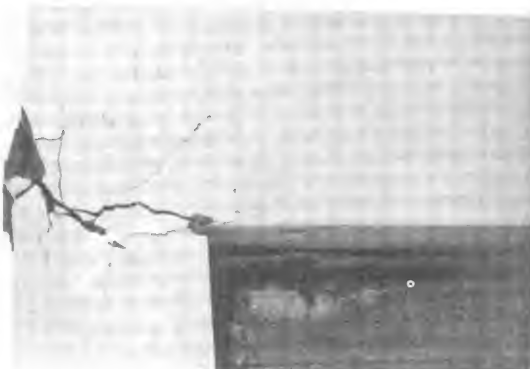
Olive View Hospital, psychiatric unit. Closeup view of beam-to-column connection.
